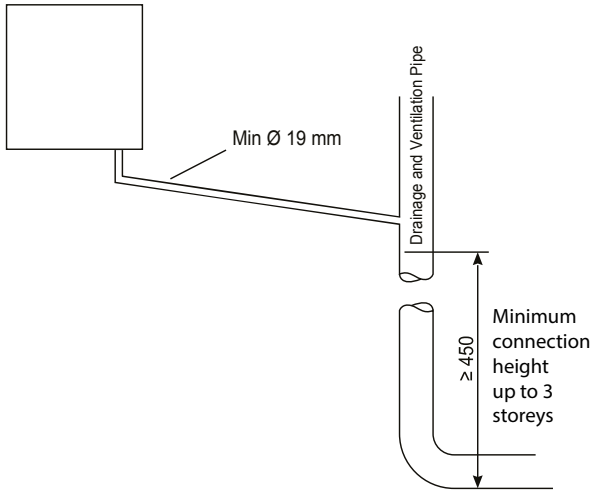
Connection of the Condensate Water Drainage Pipe to Internal Drainage and Ventilation Pipe
